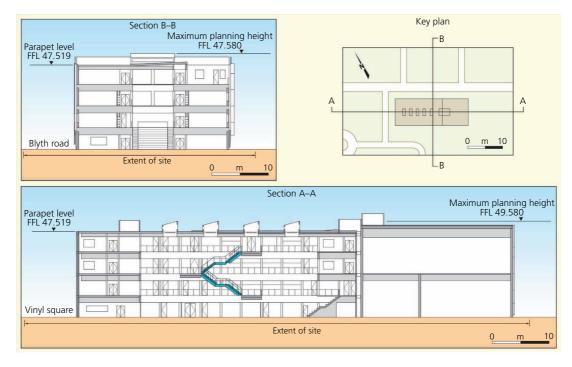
Plot location and sectional elevations of the building (units are in ft). FFL, finished floor level (source: King, 2020)
